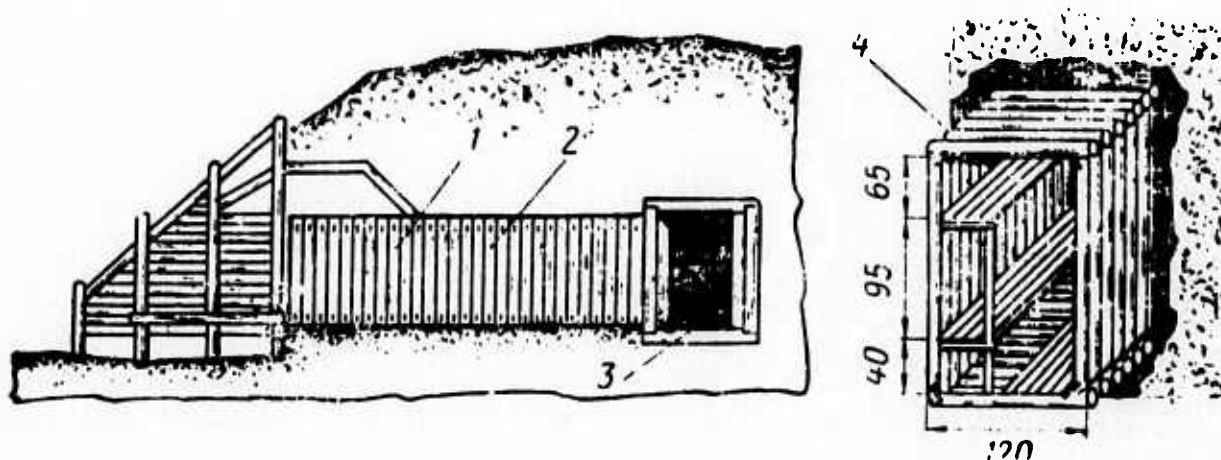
Tunnel (cross section): (1) entrance; (2) wooden frames; (3) tunnel; (4) frames made of logs or beams.
